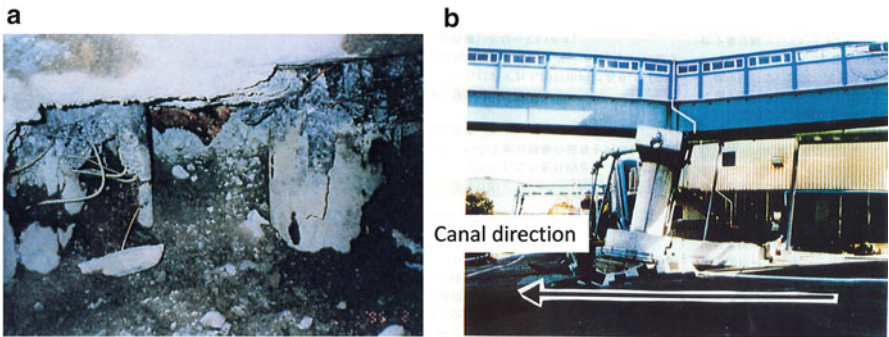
Rupture of foundation piles and movement of foundation of a pedestrian bridge by liquefaction-induced ground displacements. (a) Rupture of foundation piles. (b) Movement of foundation of a pedestrian bridge (the foundation moved towards the canal)
